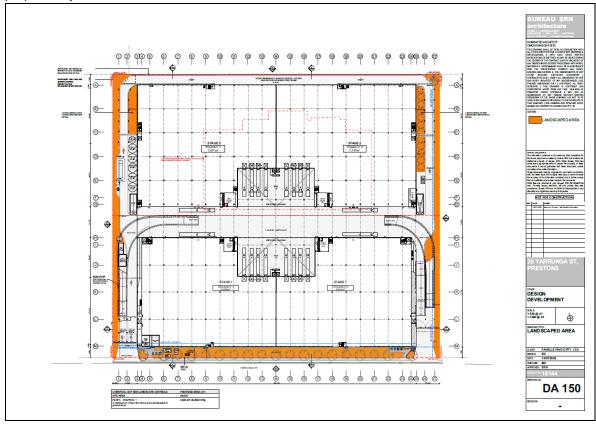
Landscaped Area Plan. Source: Plan DA150 Rev B prepared by Bureau SRH Architecture.
